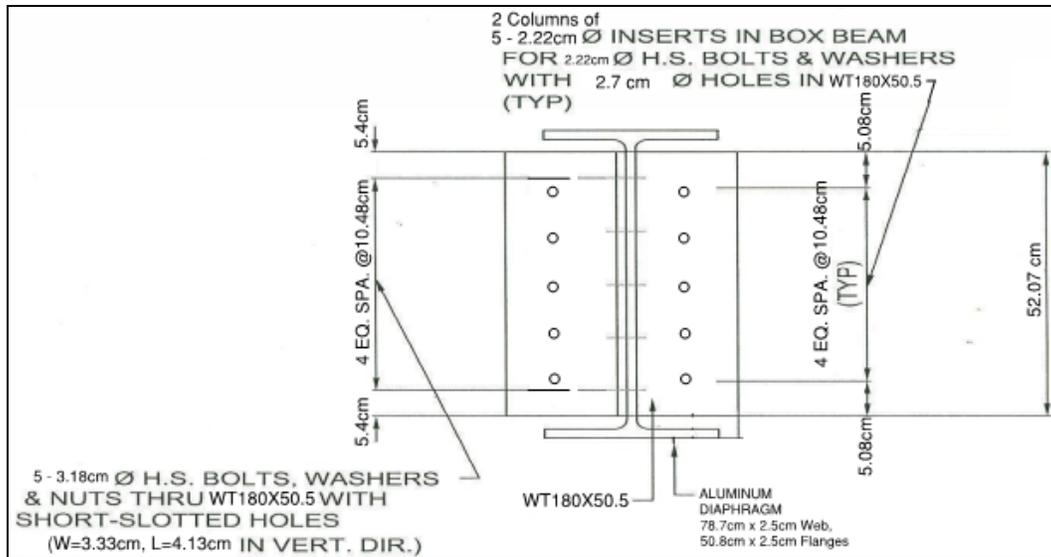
Aluminum Diaphragm Typical Section and Connection Detail
